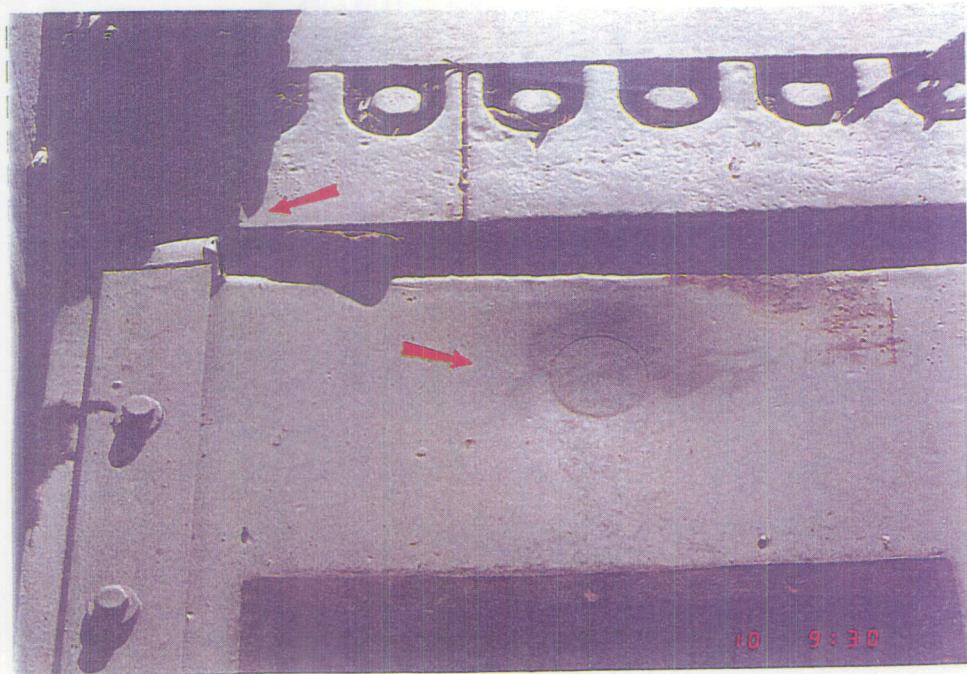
Morris Dam - 70' x 18' Drum Gates - Gate #1, View immediately upstream of hatch (Photo 8). Right pointing arrow shows local buckling caused by hydraulic ram used to unwedge gate. Left pointing arrow shows edge of shield guard which is interfering with the small 1/4" thick bar just to the left. - Sept 10, 1998.
